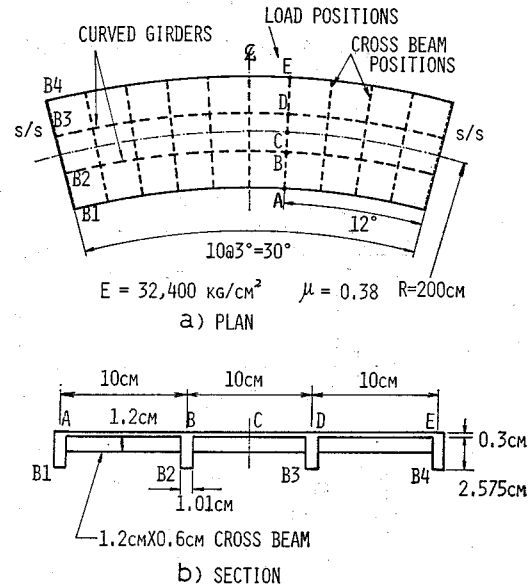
A Curved Girder Bridge Model (EX. 1)
